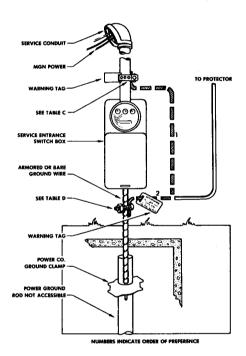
MGN Power Grounded to Inaccessible Ground Rod—No Water Pipe—Connection to Pipe Not Possible
